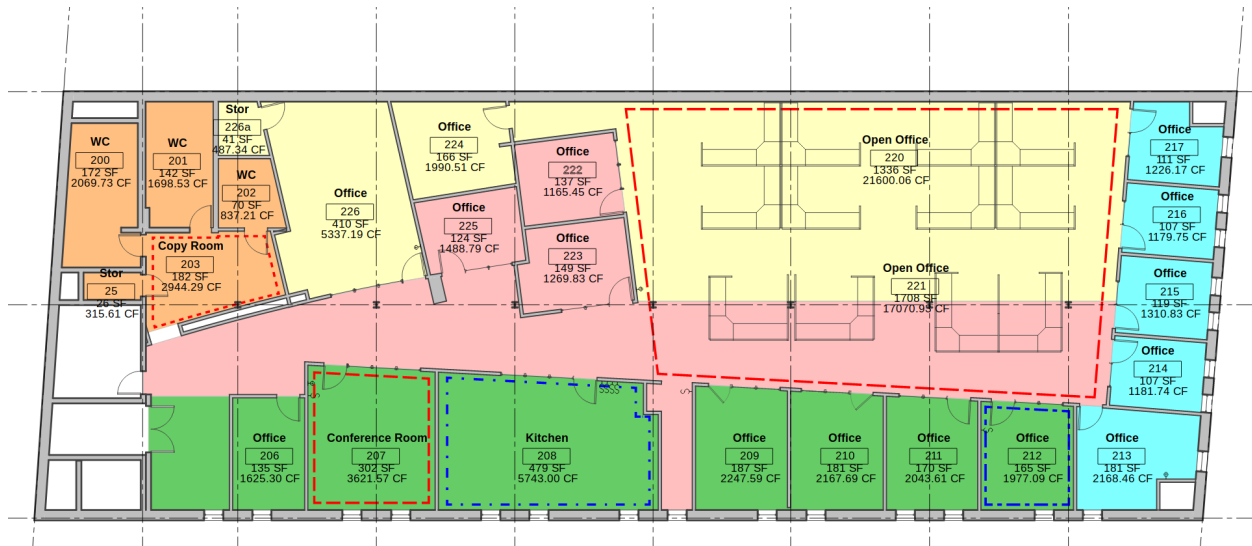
Floor plan showing HVAC zones. There was a Hamilton sensor in each of the private offices on the east and south of the building, and distributed in the open plan area.
